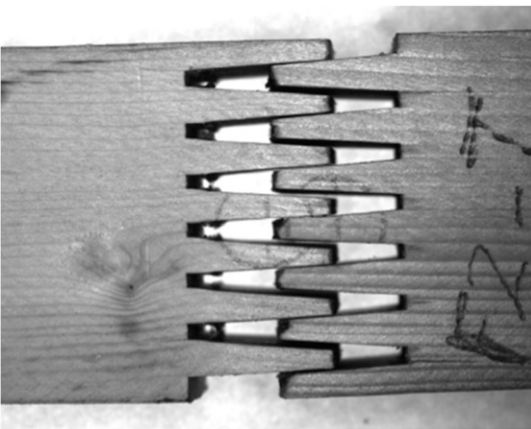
Finger joint after failure showing smooth wood surfaces that could be easily refit together.
